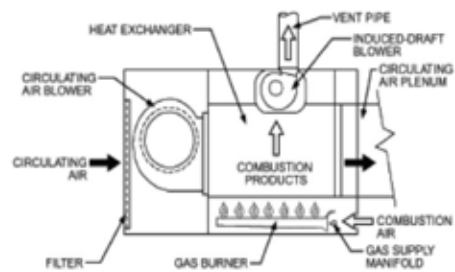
Horizontal Category I Furnace with Induced-Draft Blower
